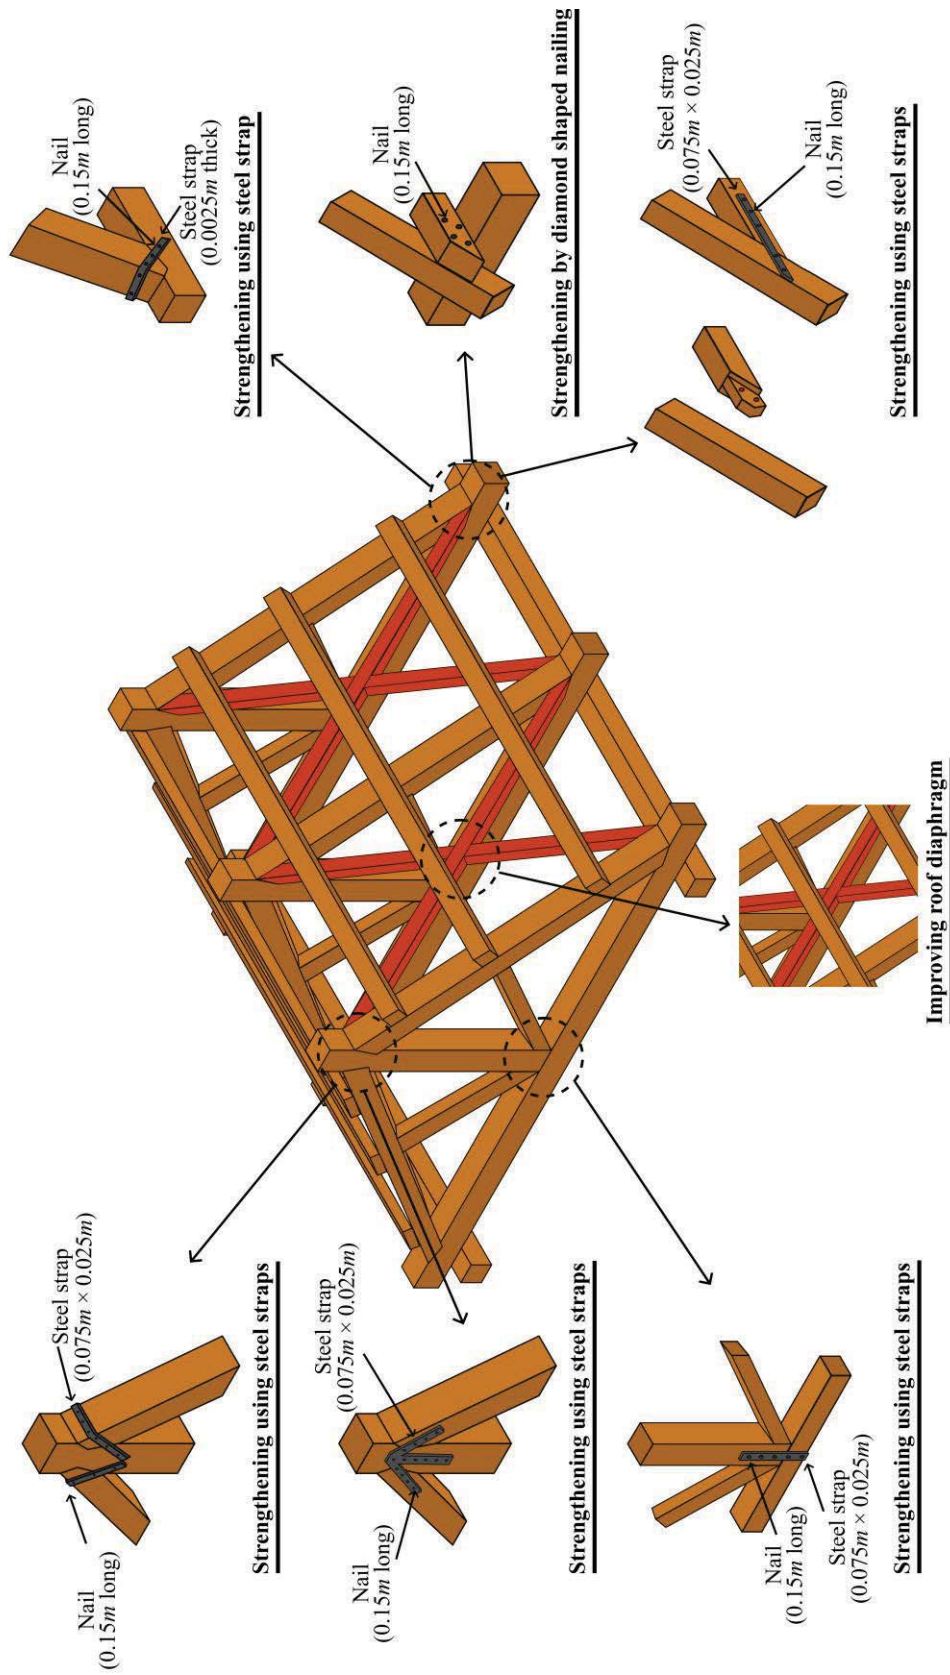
Suggested strengthening measures for improving connections of roof system in Dhajji-Dewari buildings
